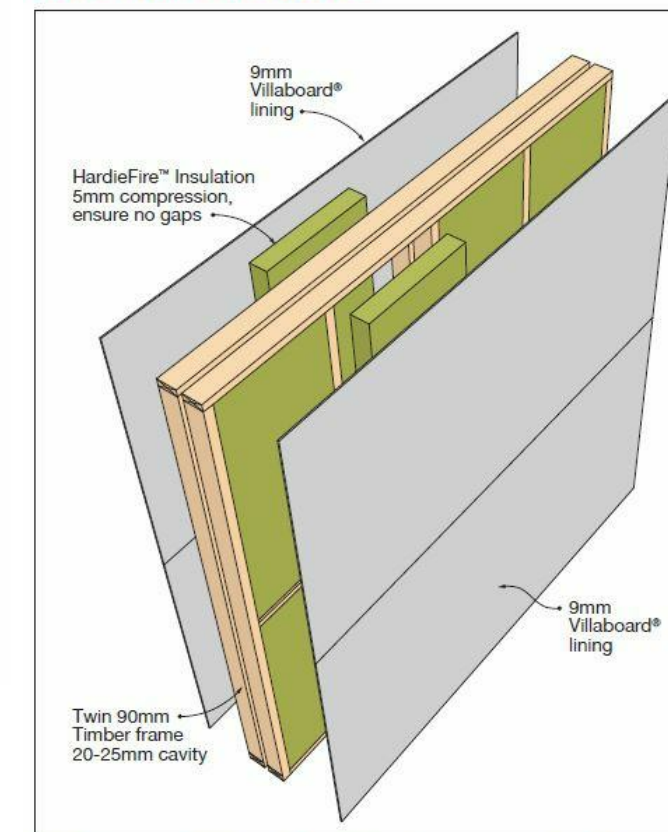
HARDIESMART™ INTERTENANCY WALL SYSTEM LAYOUT
